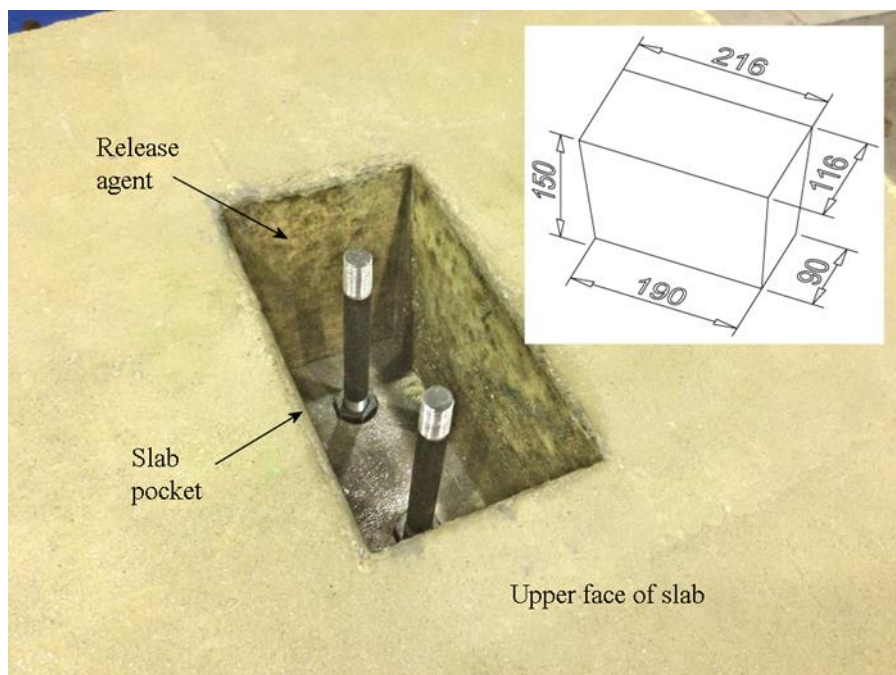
Slab pocket overview and dimensions of LNSC pushout Test 5
